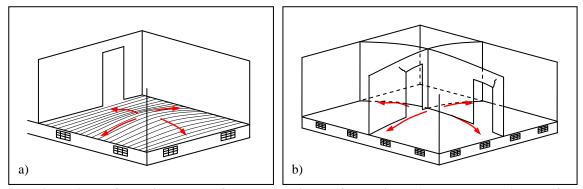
Typical deformation modes of concrete perimeter foundations, a) by room and b) whole floor.
